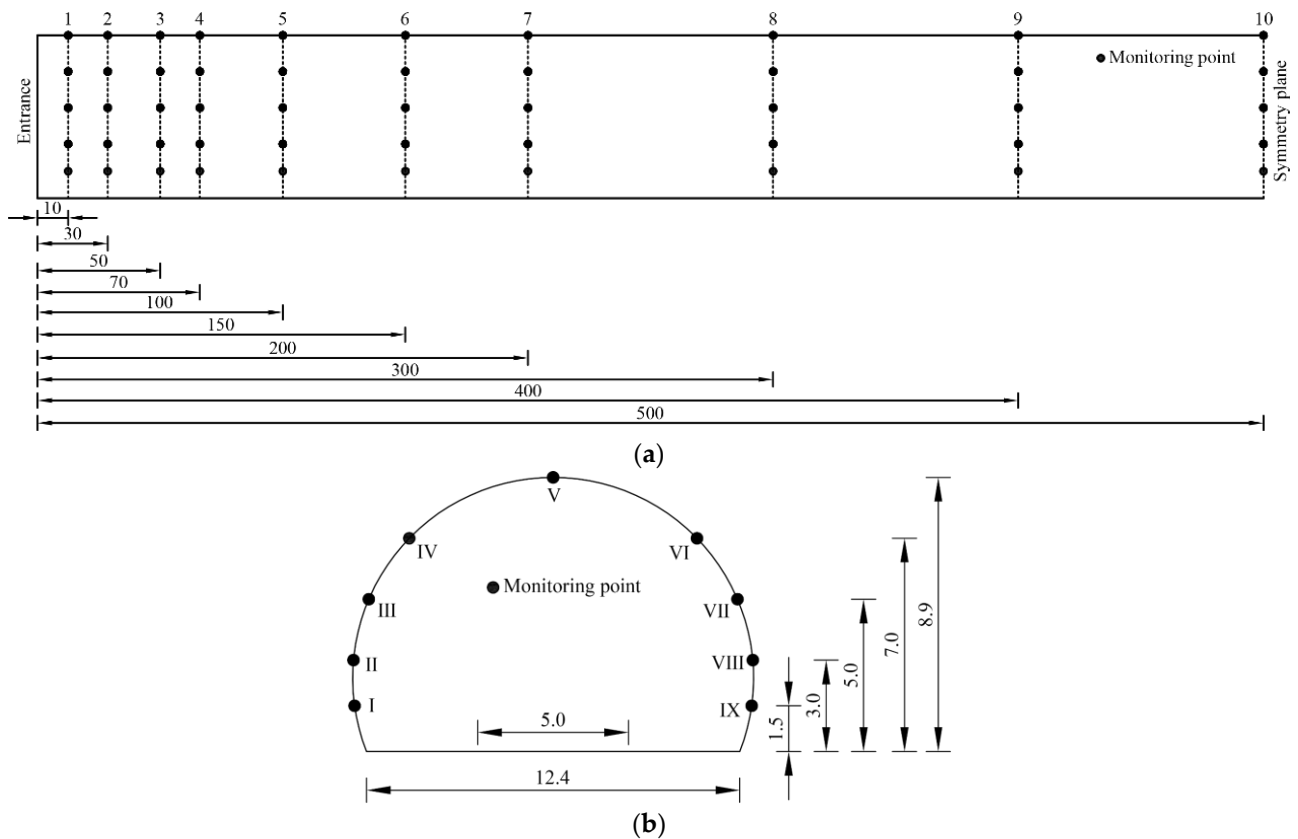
Layouts of monitoring points (unit: m). (a) Longitudinal section; (b) Cross section.
